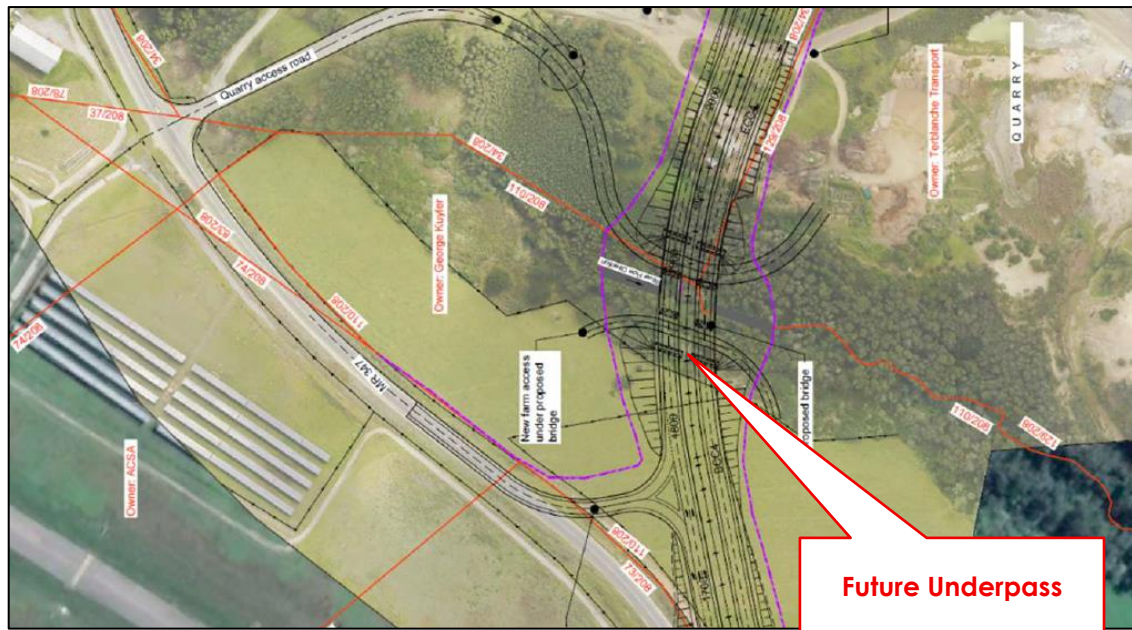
FUTURE UNDERPASS ACCESS TO PROPOSED UTILITY SITE
